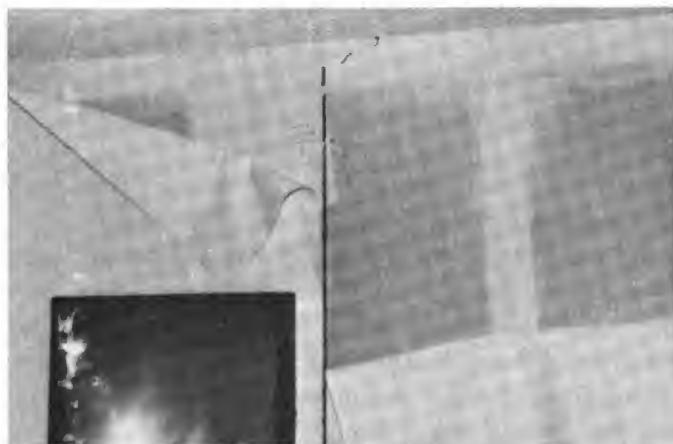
Holiday Inn, Orion Avenue. Break in gypsum wallboard on second floor. John A. Blume & Associates photograph.
